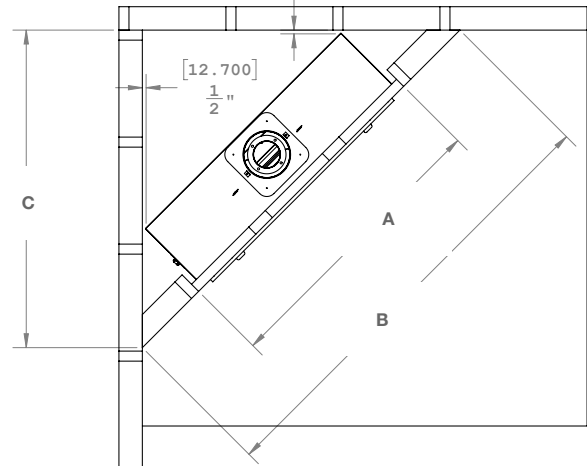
b Framing dimensions (Straight wall & Corner Installation).
